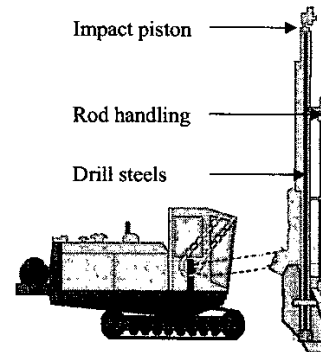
Topammer drill rig, drill steels joined together by rod handling.
